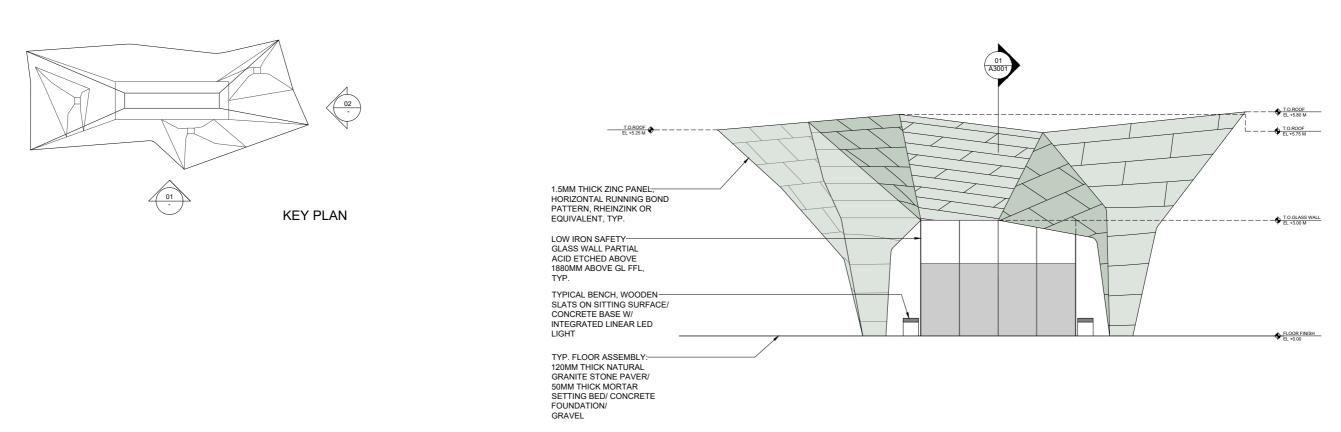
BUS INTERCHANGE W. SHELTER ELEVATION, SCALE=1/100
